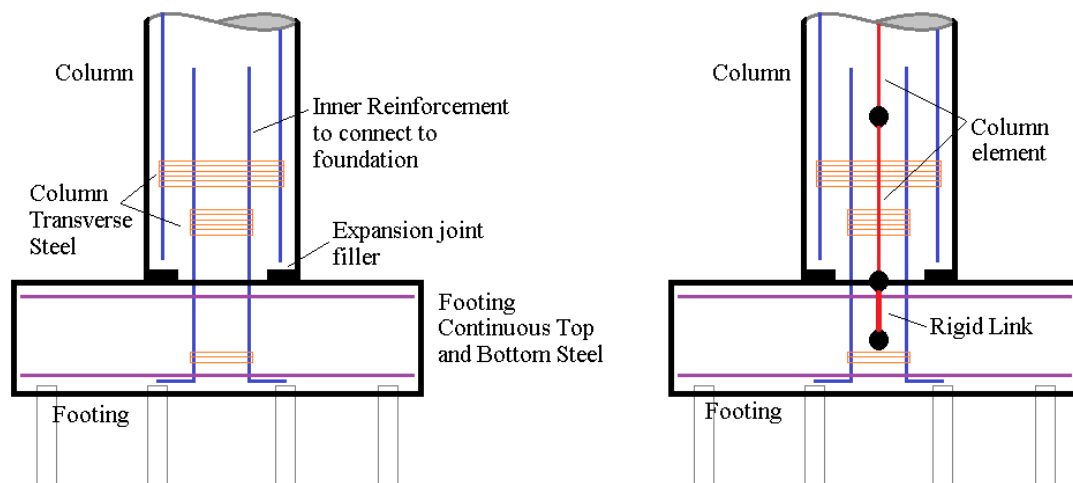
Connection between the column and foundation of bridges with multi-column bents.
